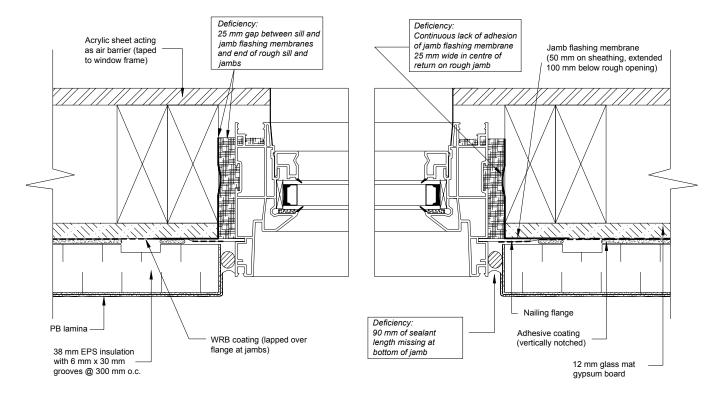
Wall/window interface for specimen No. 9 - horizontal section
